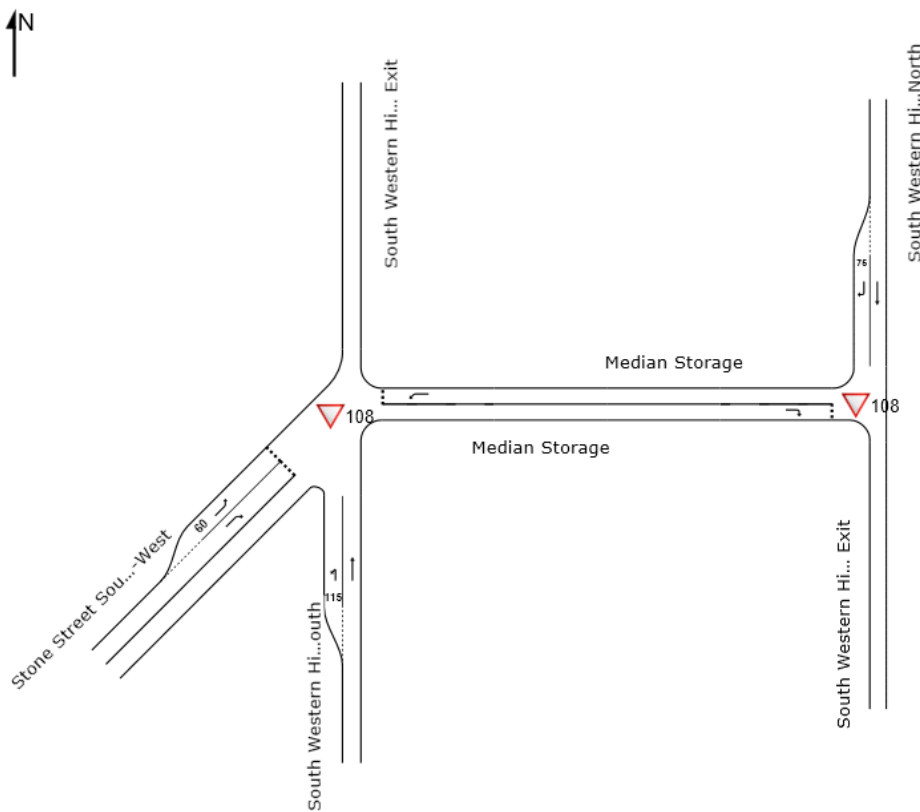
SWH/ Stone St – two staged intersection layout – without SWH duplication
